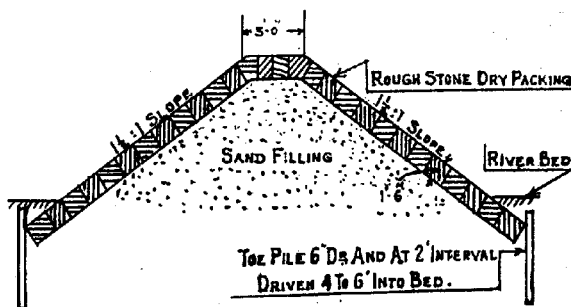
SECTION OF A SAND CORE REVETTED GROUYNE
